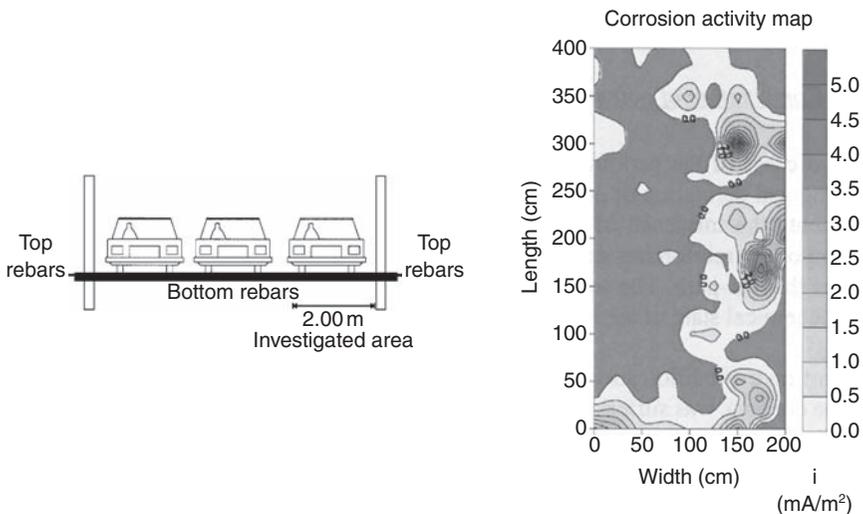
Typical pattern of corrosion activities in the parking bays of a garage (source: Pruckner (2002)).
